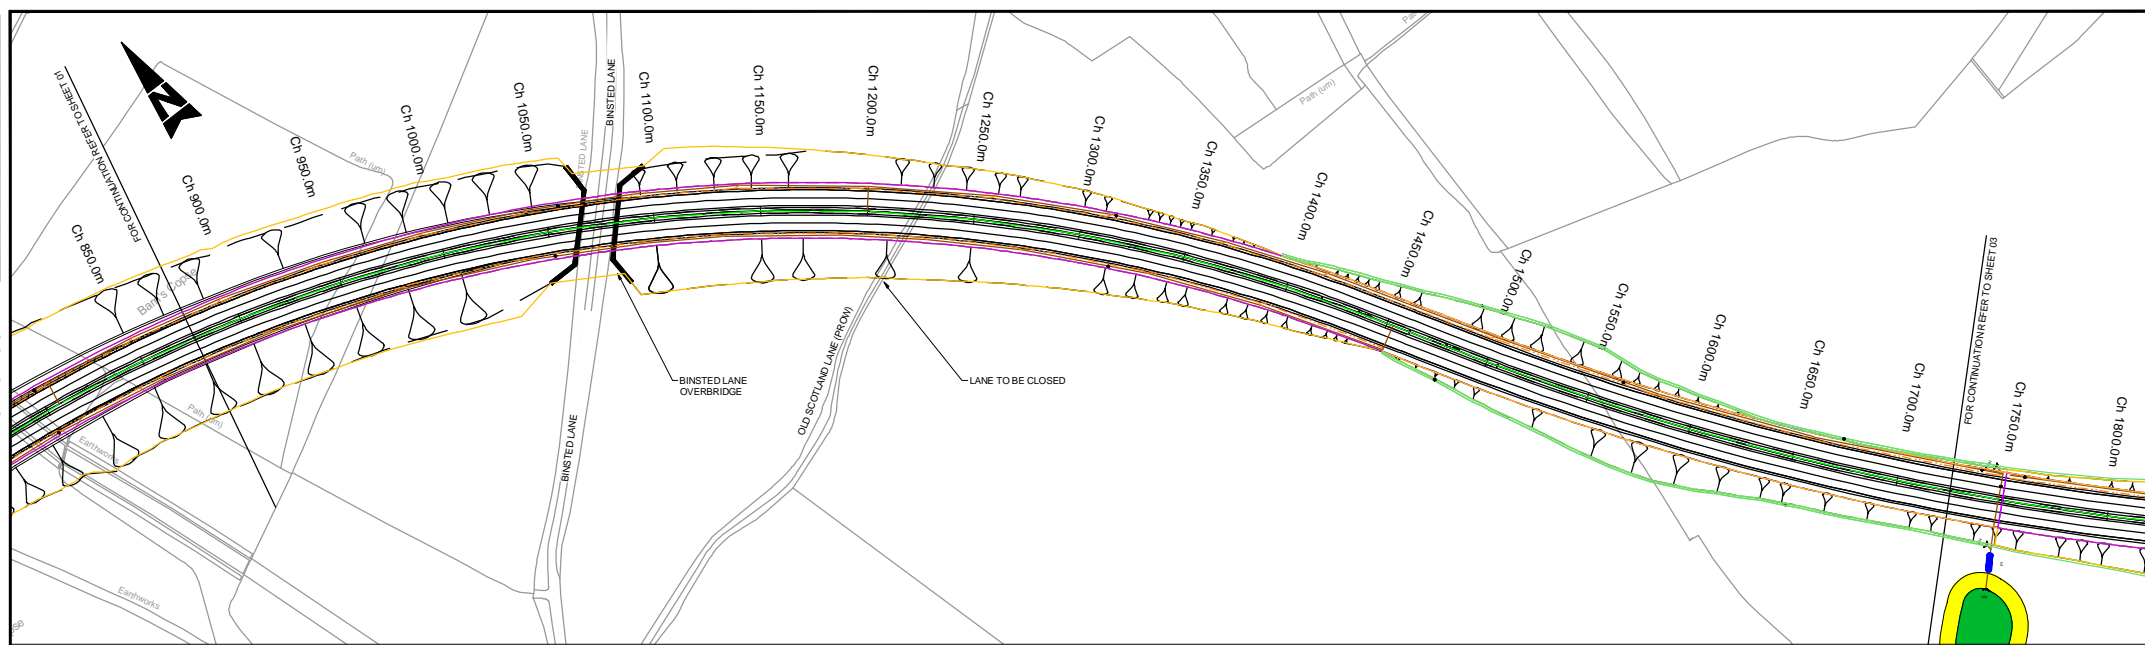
Drawing Number: HE55123 - WSP - HDG - A27AR - DR - D - 0601
